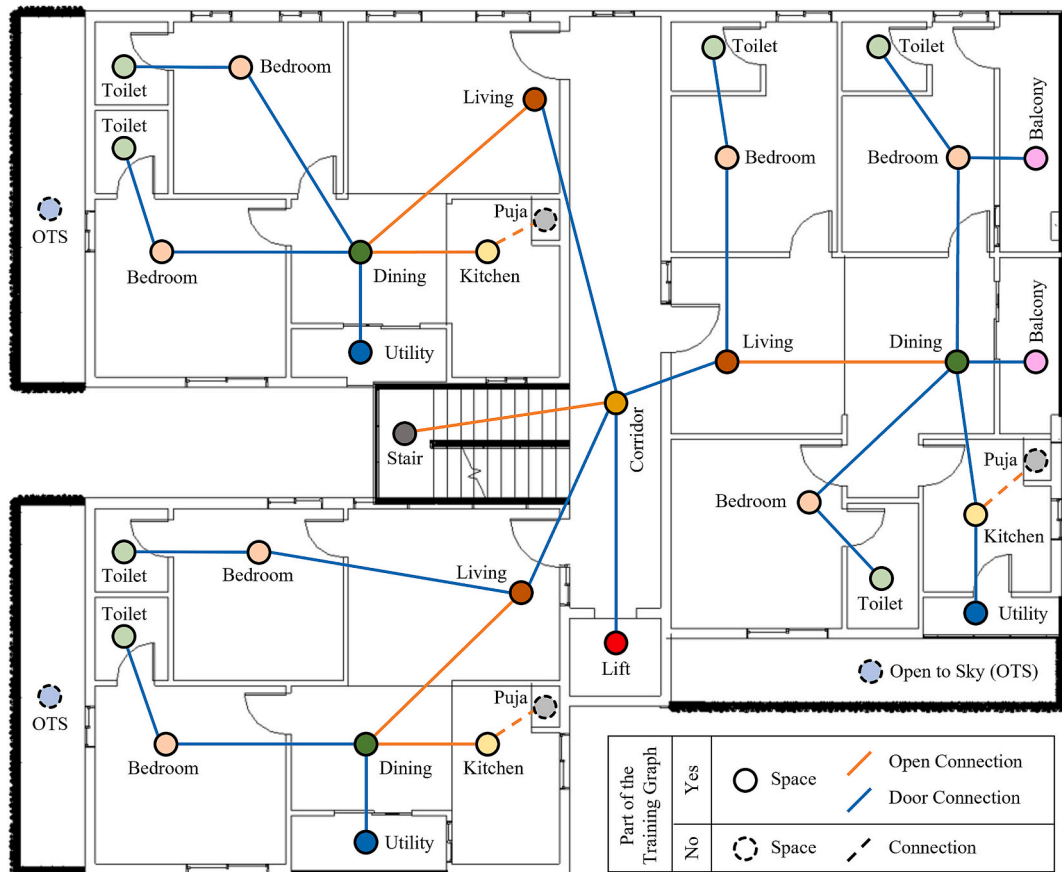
Standard floor plan of a typical Indian residential apartment building.
